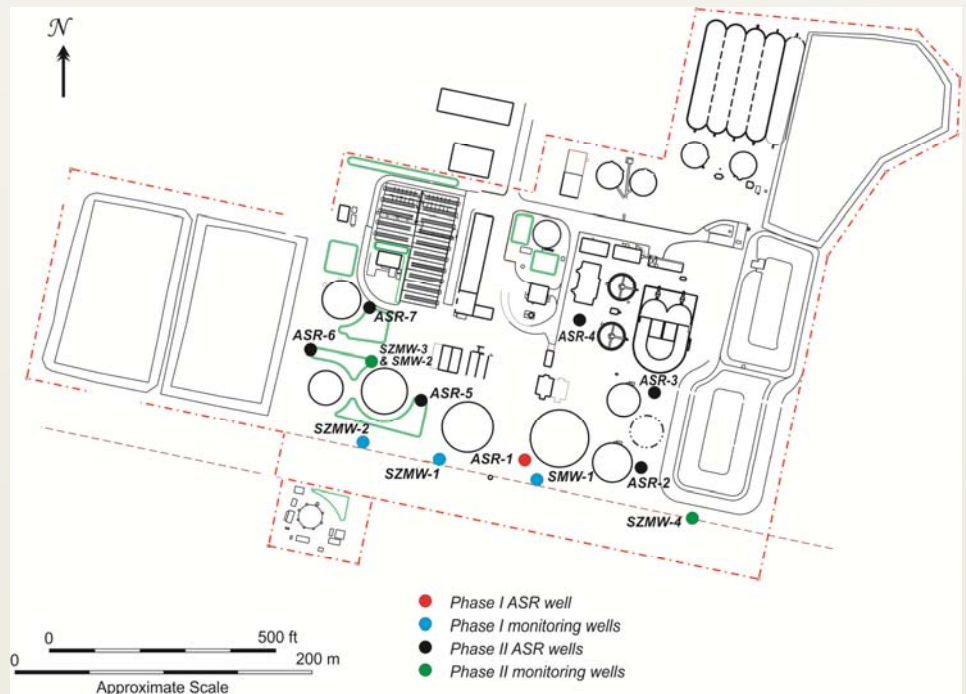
Site Plan of the George F. French Water Reclamation Facility showing locations of ASR system wells
